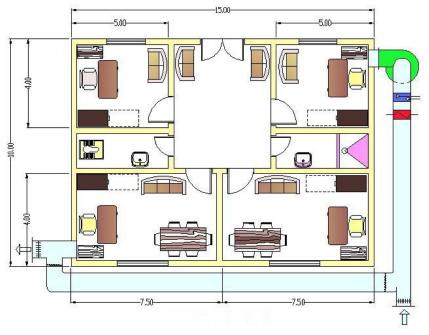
Building of one story with walls, ceiling and floor made of bricks contains furniture
